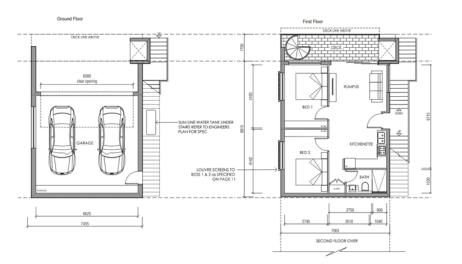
Ground and first floor layout for each unit (Oramatis, 2022)
